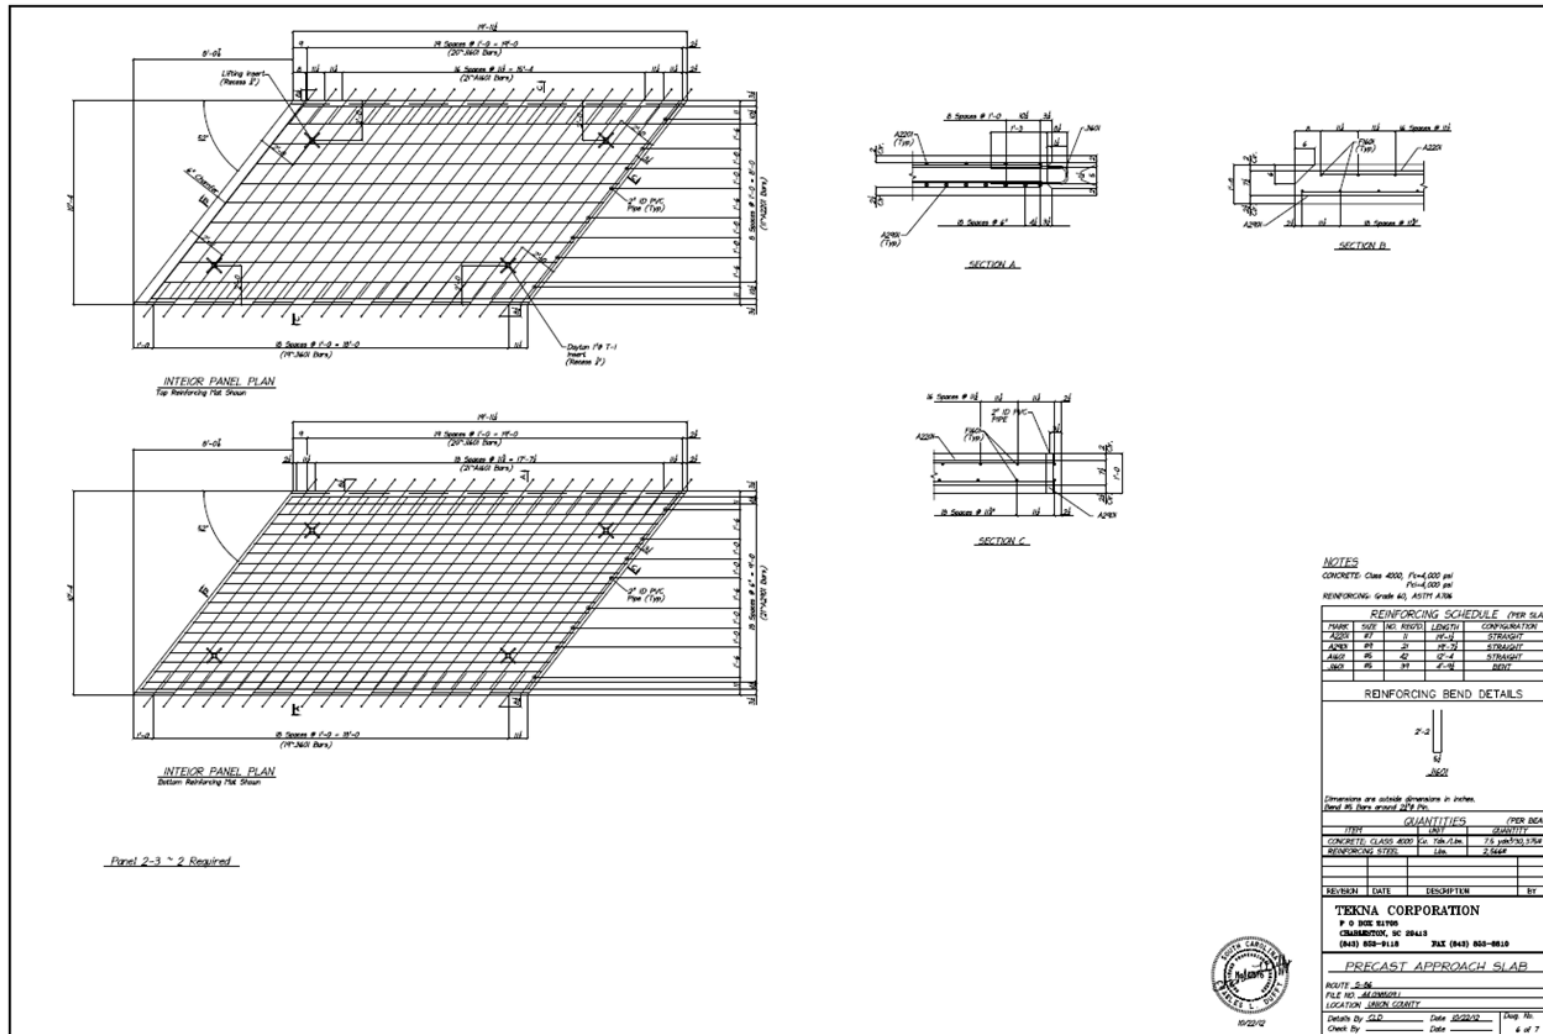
Bent Four 'interior' slab 2-3 reinforcement schematic
